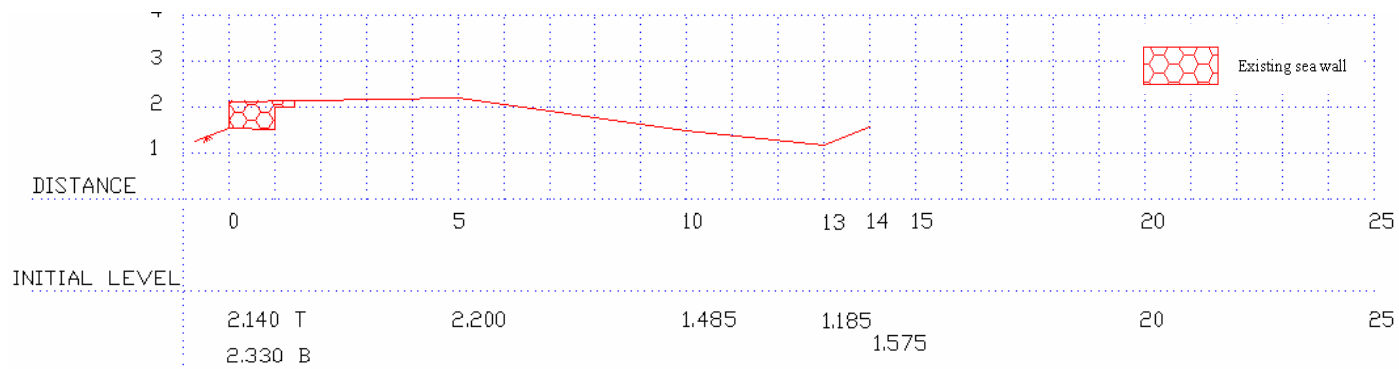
Cross-section of the existing damaged seawall (as per KID) at Punnapra
